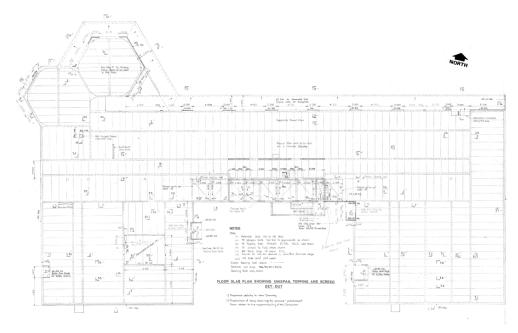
Spinal Injuries Unit – Ground Floor Precast Slab Plan
